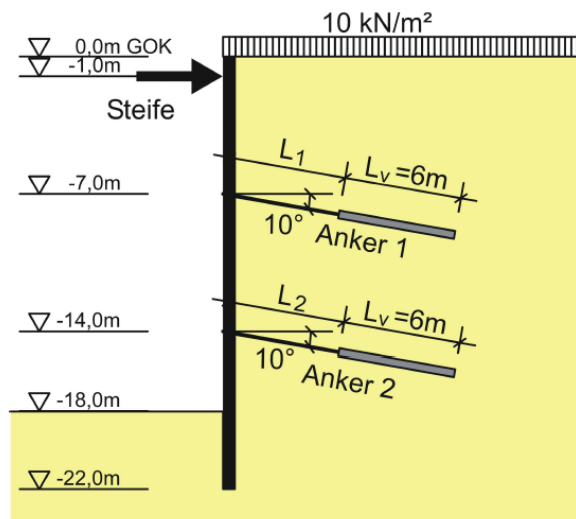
Cross-section of the calculated multiple anchored sheet pile wall [19]
